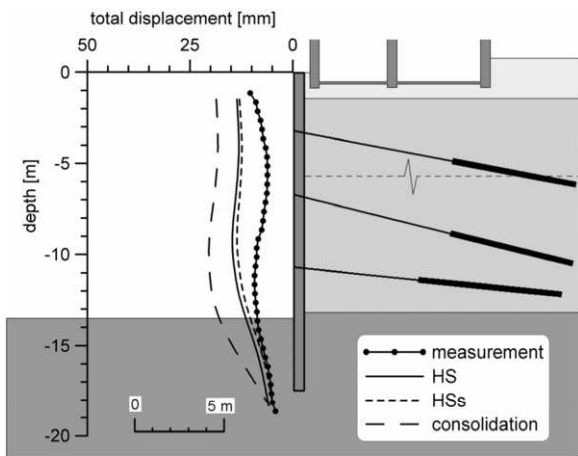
Anchored retaining wall No. 1 at site A: layout and horizontal displacements
